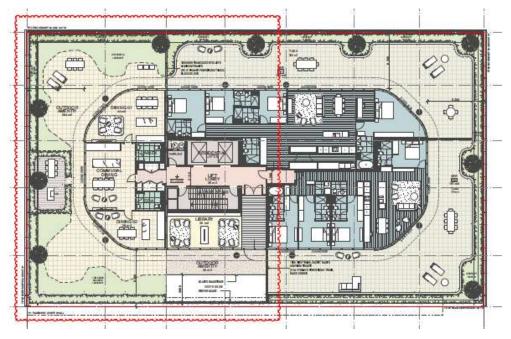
Amended plans - Level 6: Amenities (Indoor/Outdoor & Terrace)/Green wall
